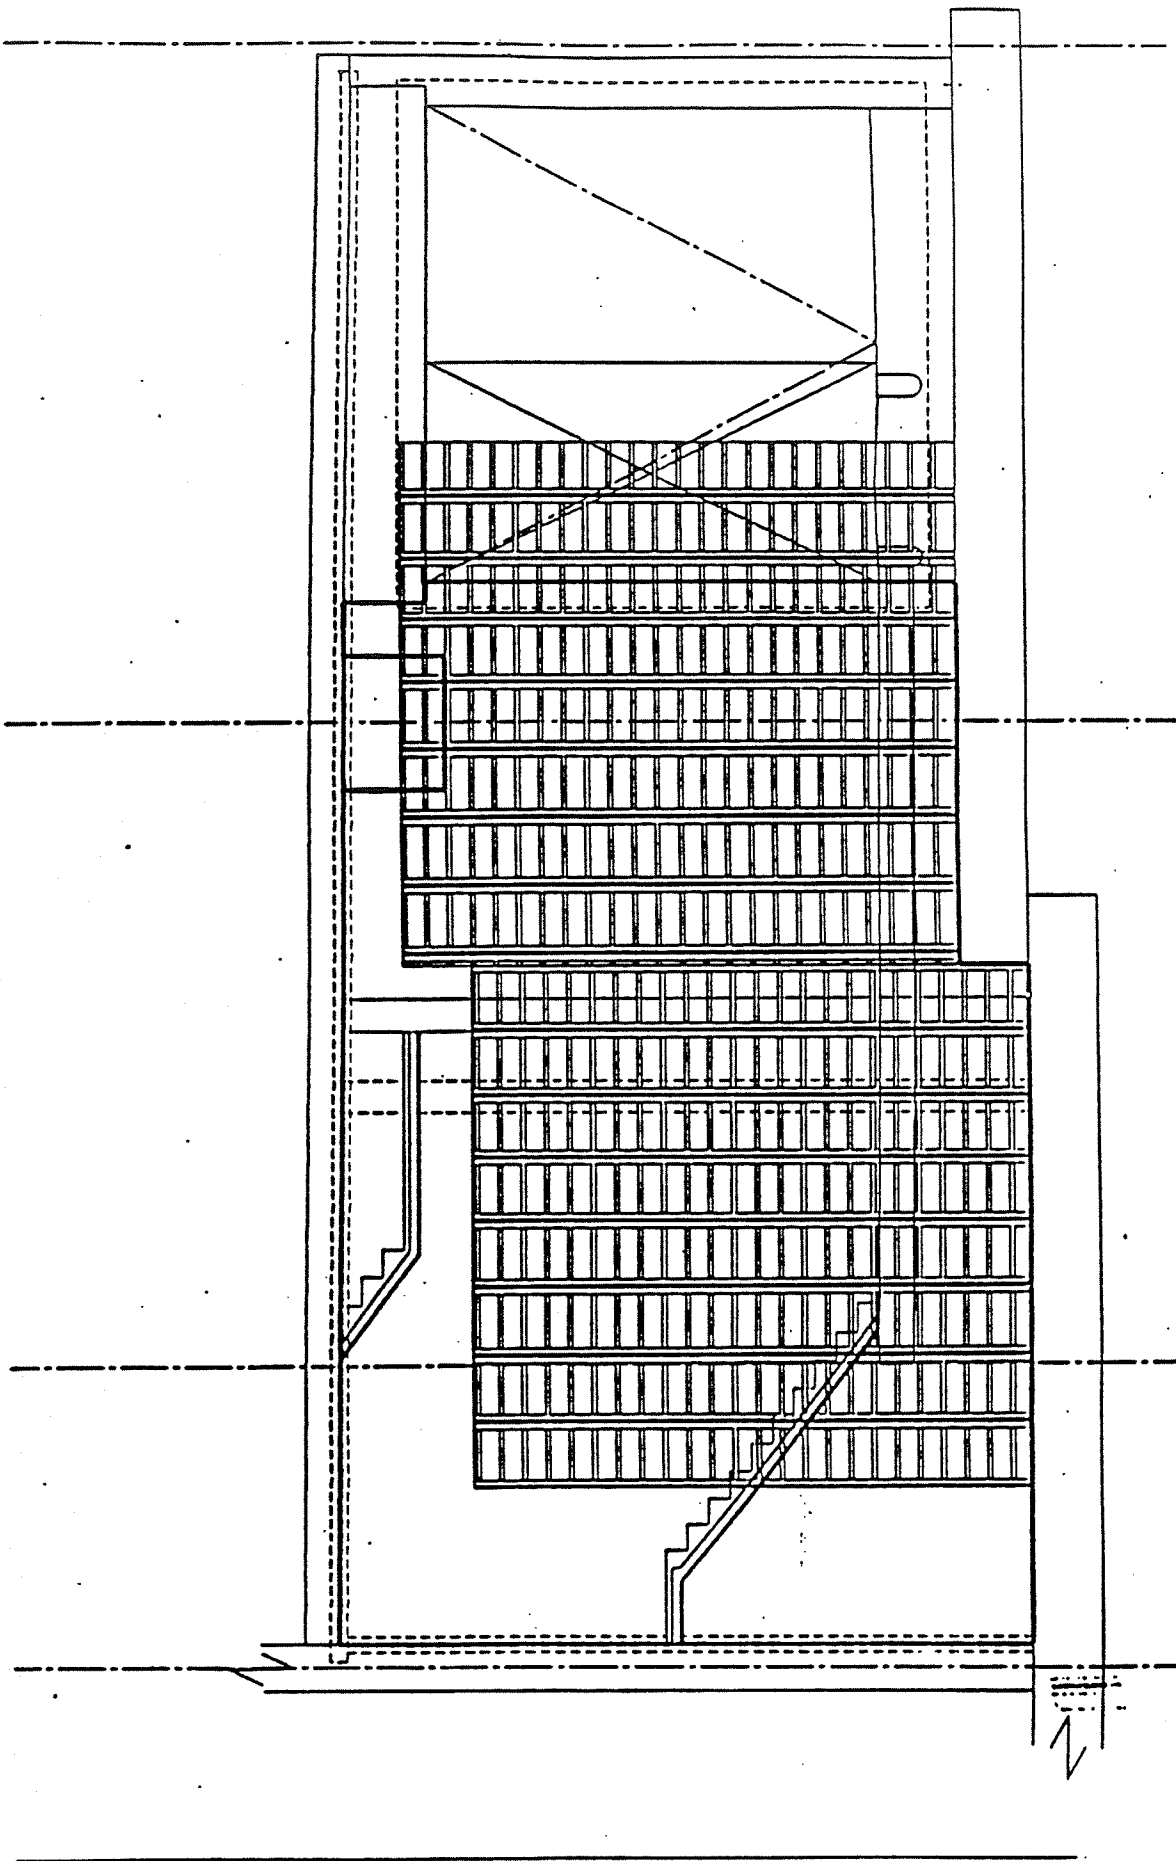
Form Reuse Drawing. This drawing shows how one contractor used CAD to design concrete formwork. Shown are two standard "gang forms" superimposed on a proposed concrete placement. The project engineer's next step would be to design the formwork for the areas still exposed. Alternatively, he could move the gang forms and have different areas to form.
